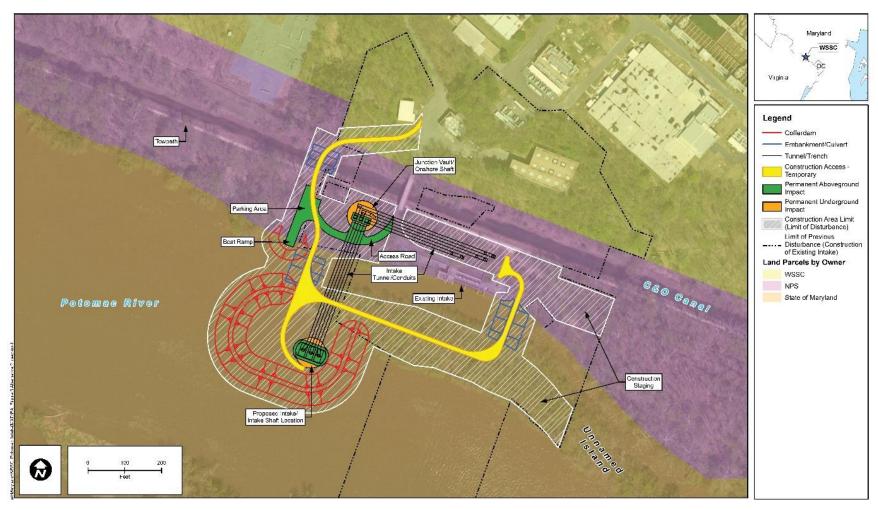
Alternative 2, Tunneling to Onshore Shaft West of Existing Intake.
